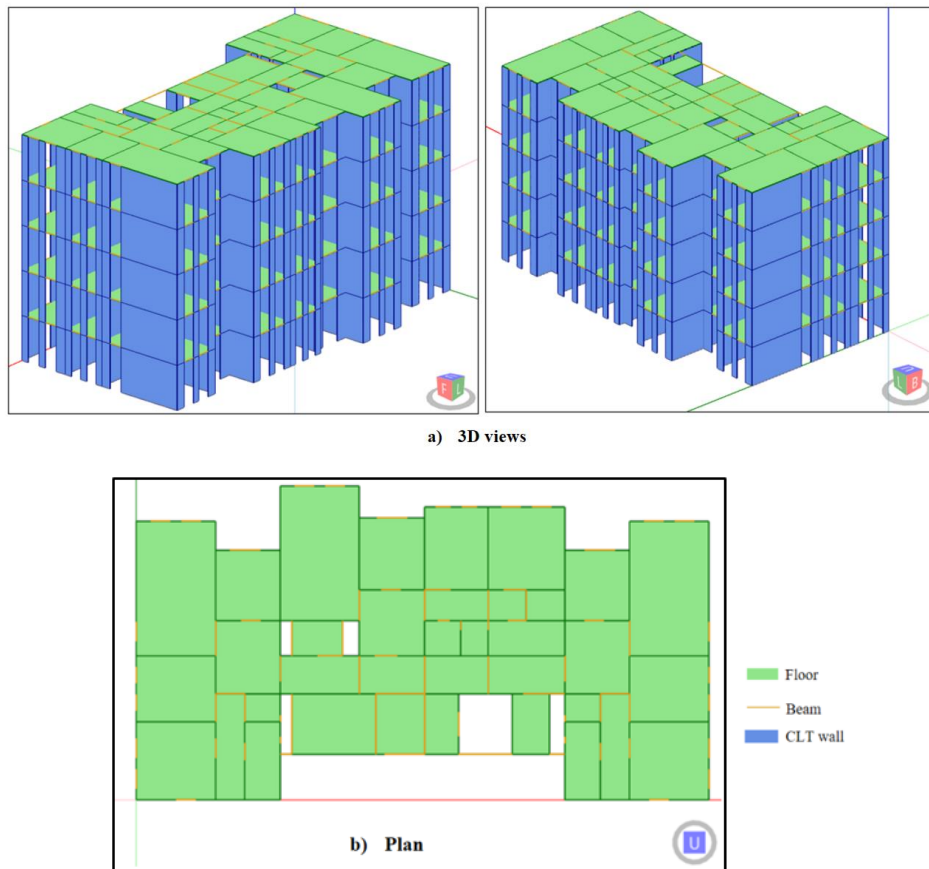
The model of a five-story CLT residential building a) 3D views and b) Plan
